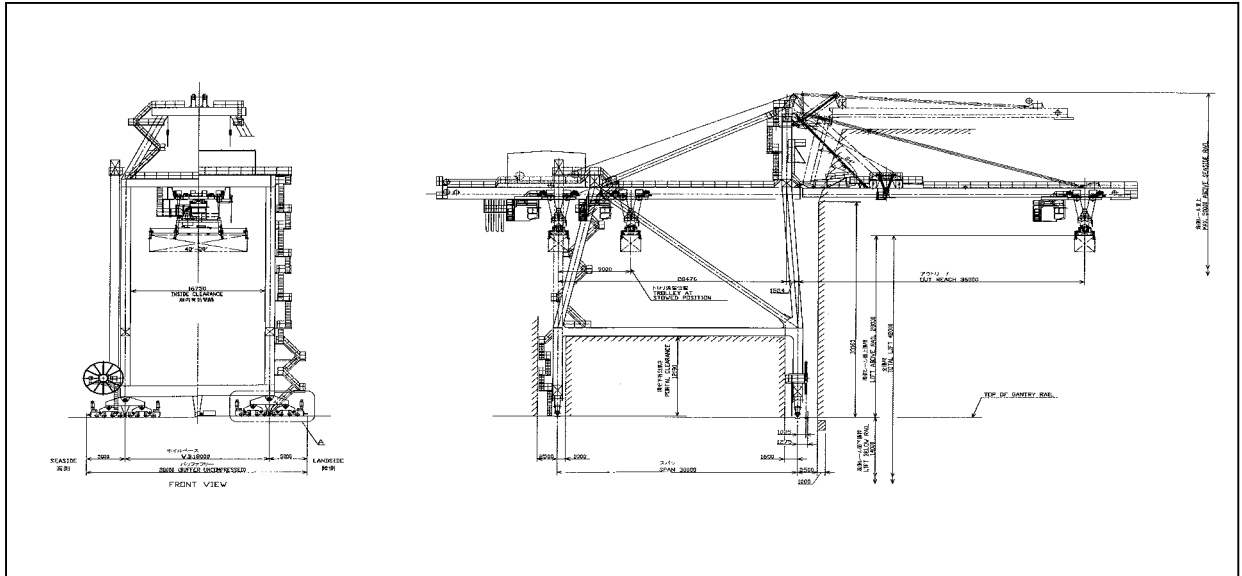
F-5 Typical Sections of Quay Gantry Crane
